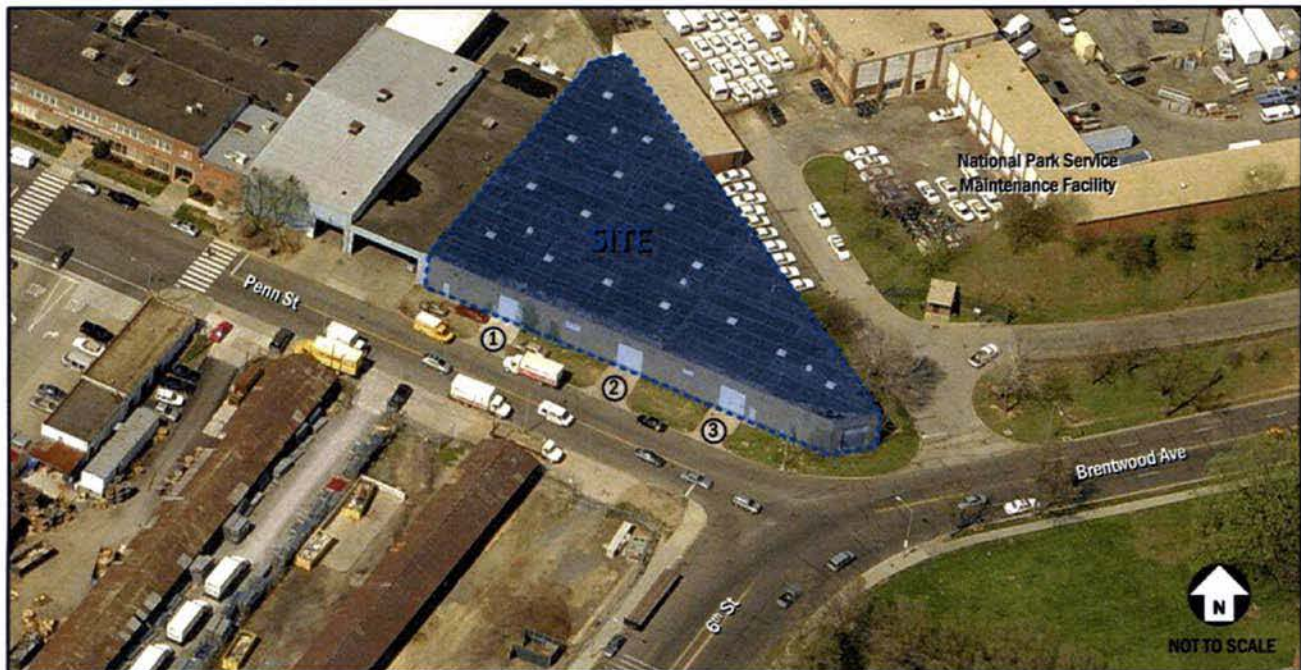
550 Penn Building Footprint and Existing Loading Facilities
